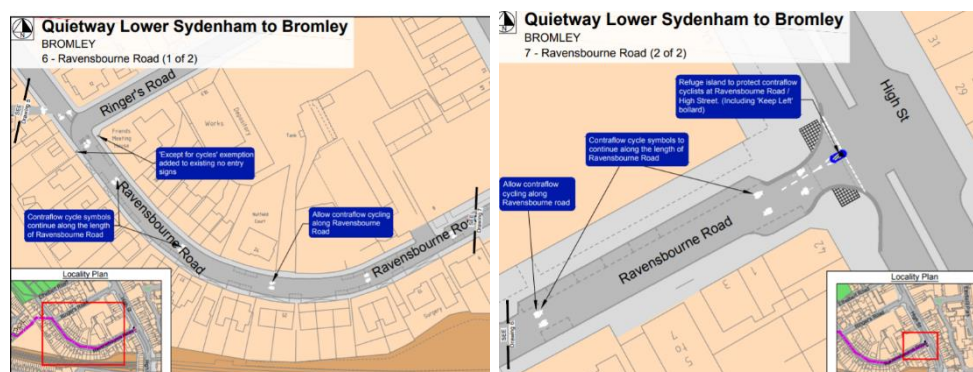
Cycle and walking routes (Quietway) improvement works between Lower Sydenham and Bromley Town centre.
